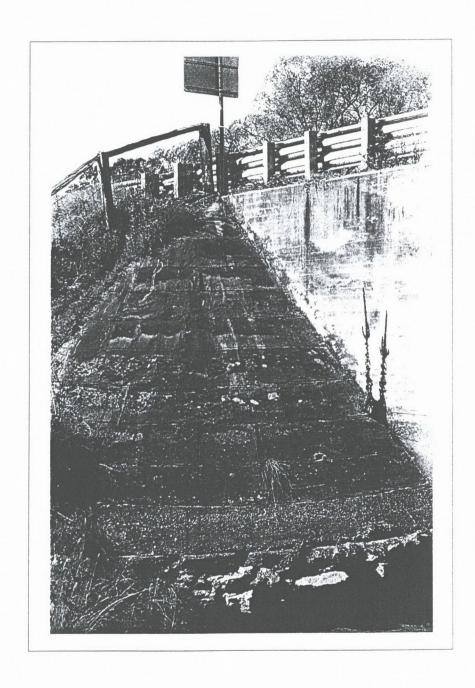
Detail of concrete mound beside wingwall on southern abutment
